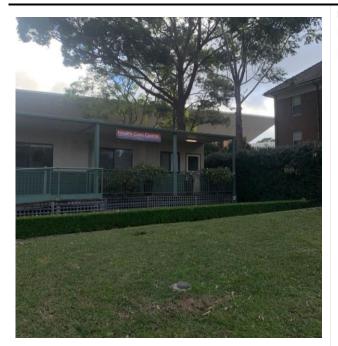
Taken showing the northern retaining wall, facing west.
